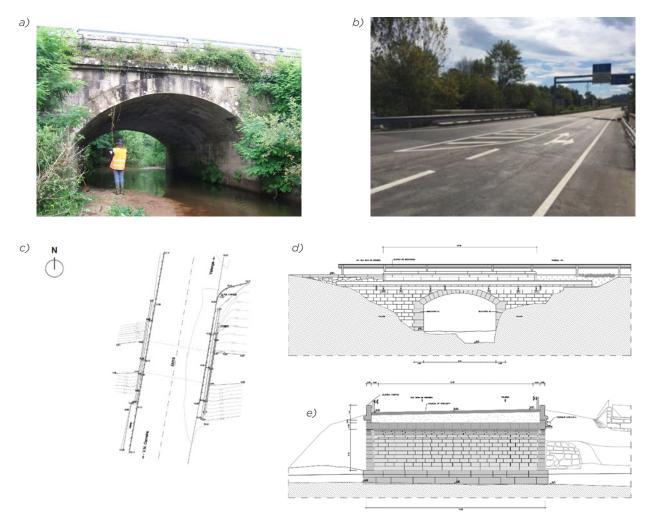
Formigosa bridge a) side view, (Infraestruturas de Portugal, 2006); b) deck view, (Infraestruturas de Portugal, 2015); c) elevation; d) plan view; e) cross section, (Infraestruturas de Portugal, 2012)
